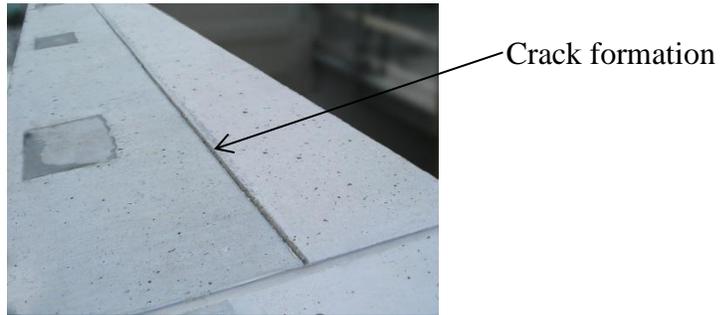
Crack formation at the top of parapet in composite panel
